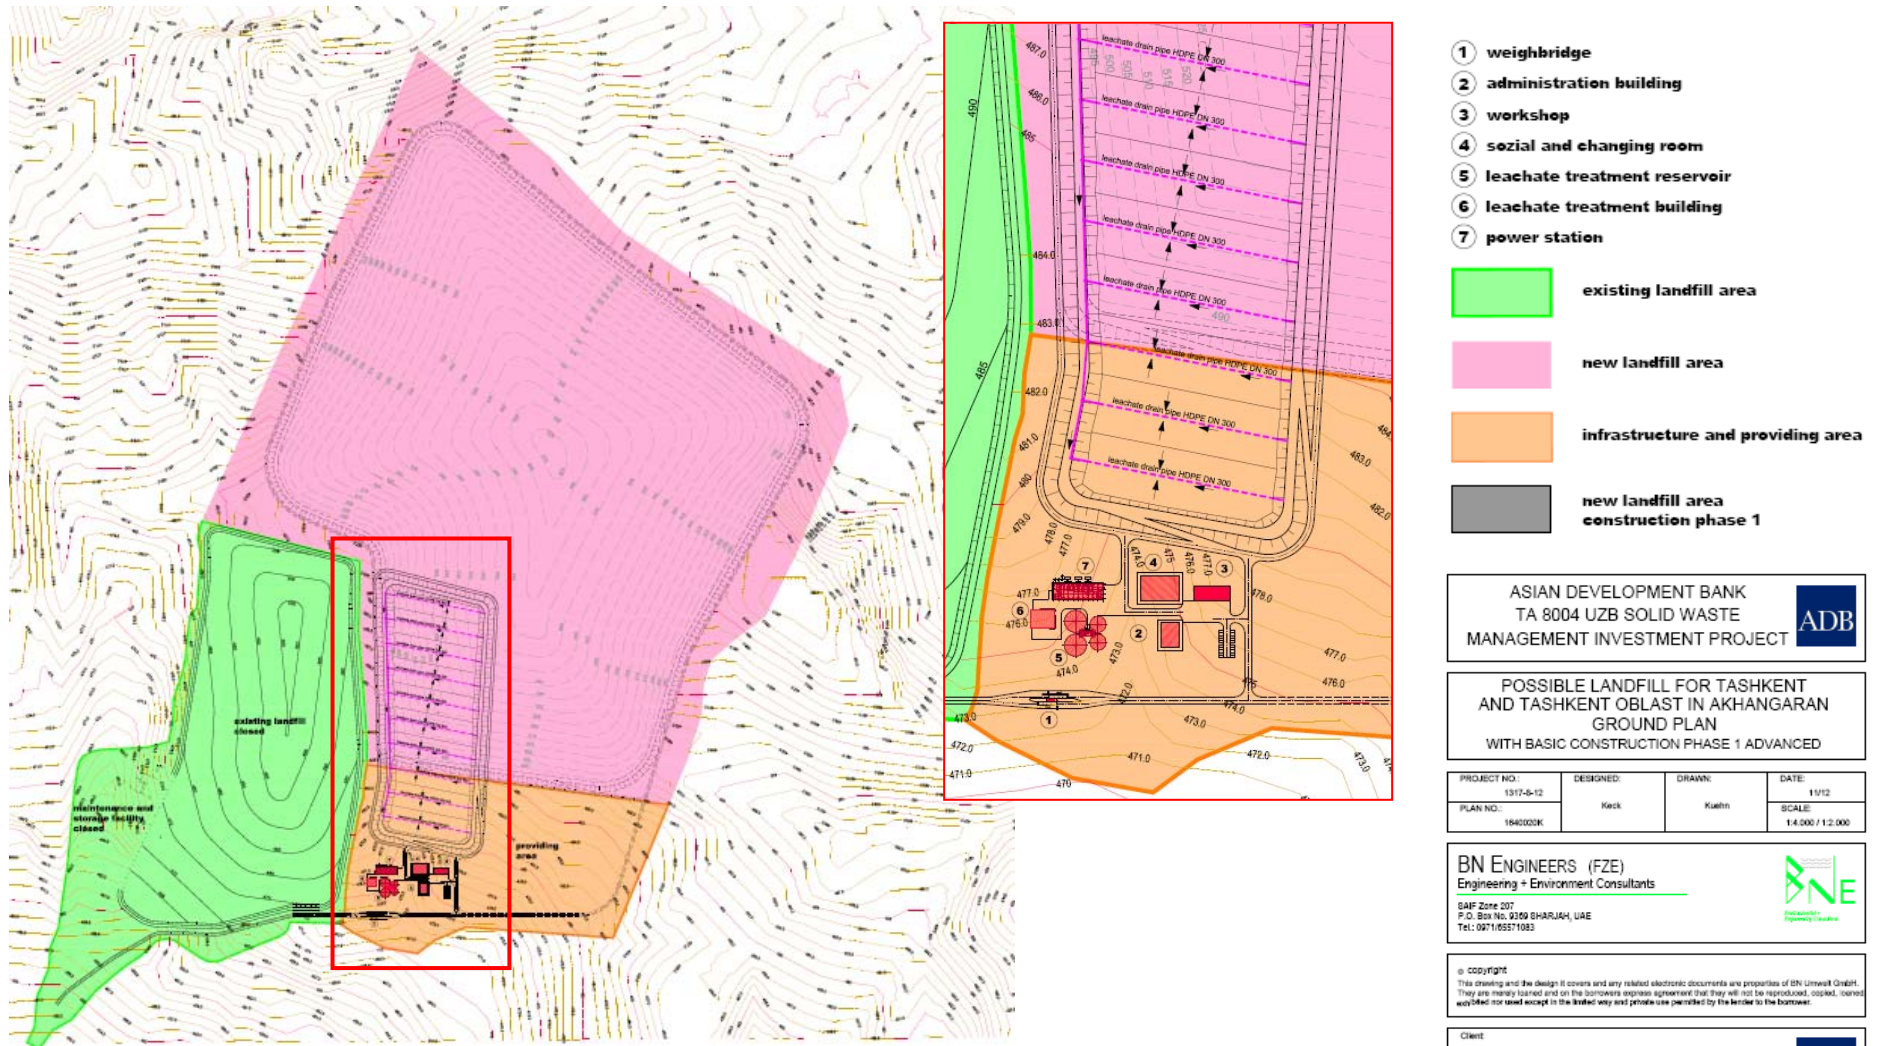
Lot plan of the Proposed Sanitary Landfill Facility
